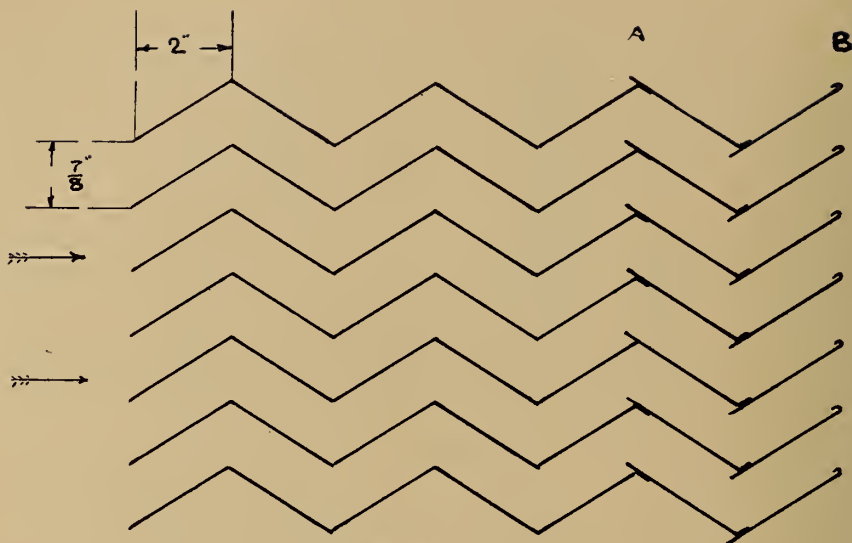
HORIZONTAL SECTION THROUGH SEPARATOR PLATE.
